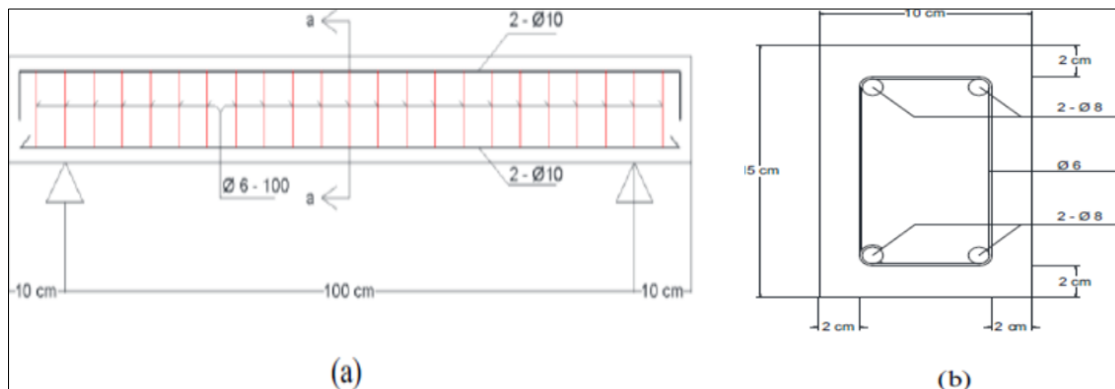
(a) The arrangement of the specimen's long section, and (b) the layout of the section
